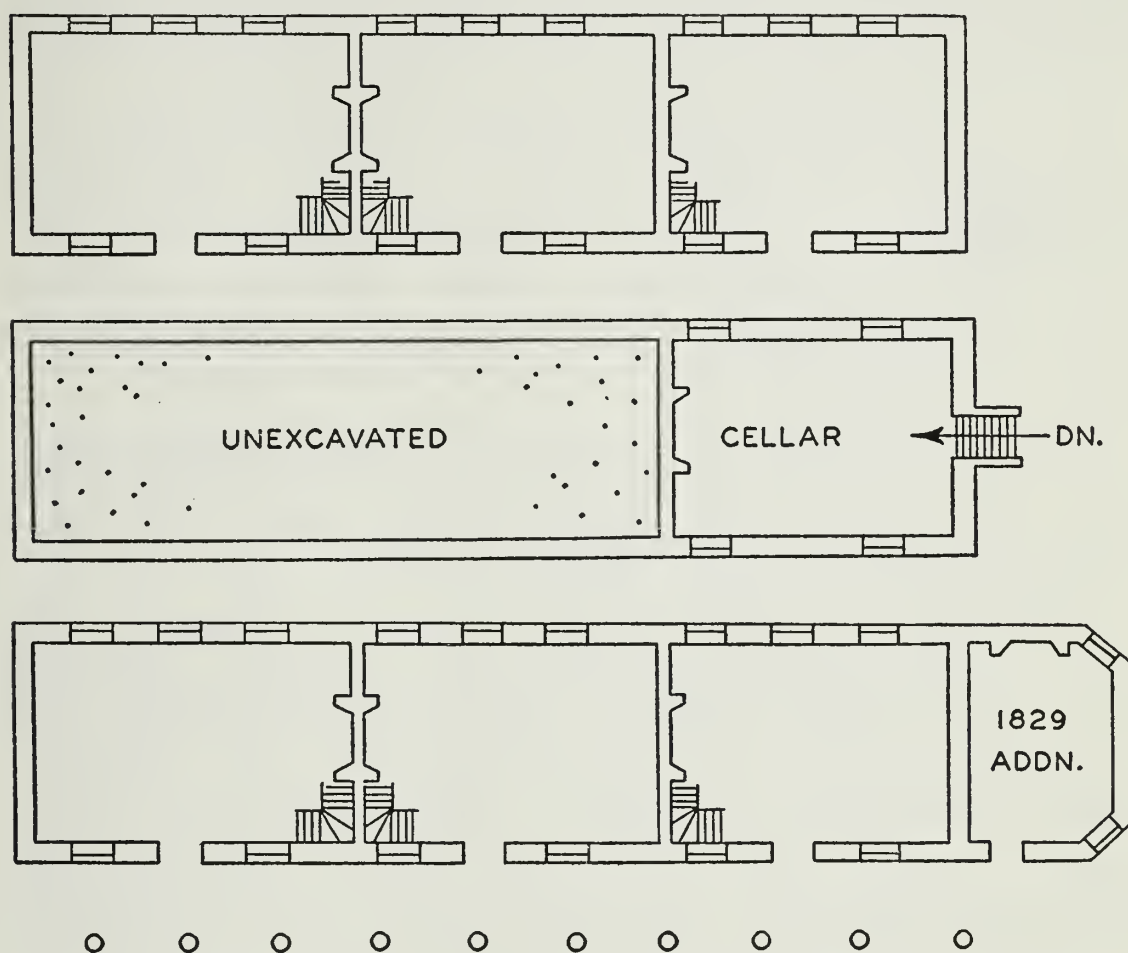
Building D, soldiers' barrack. The first two illustrations, from the top, show the main and cellar floor plans in 1814. The third is the floor plan of 1834 showing an additional room and porticoes.
